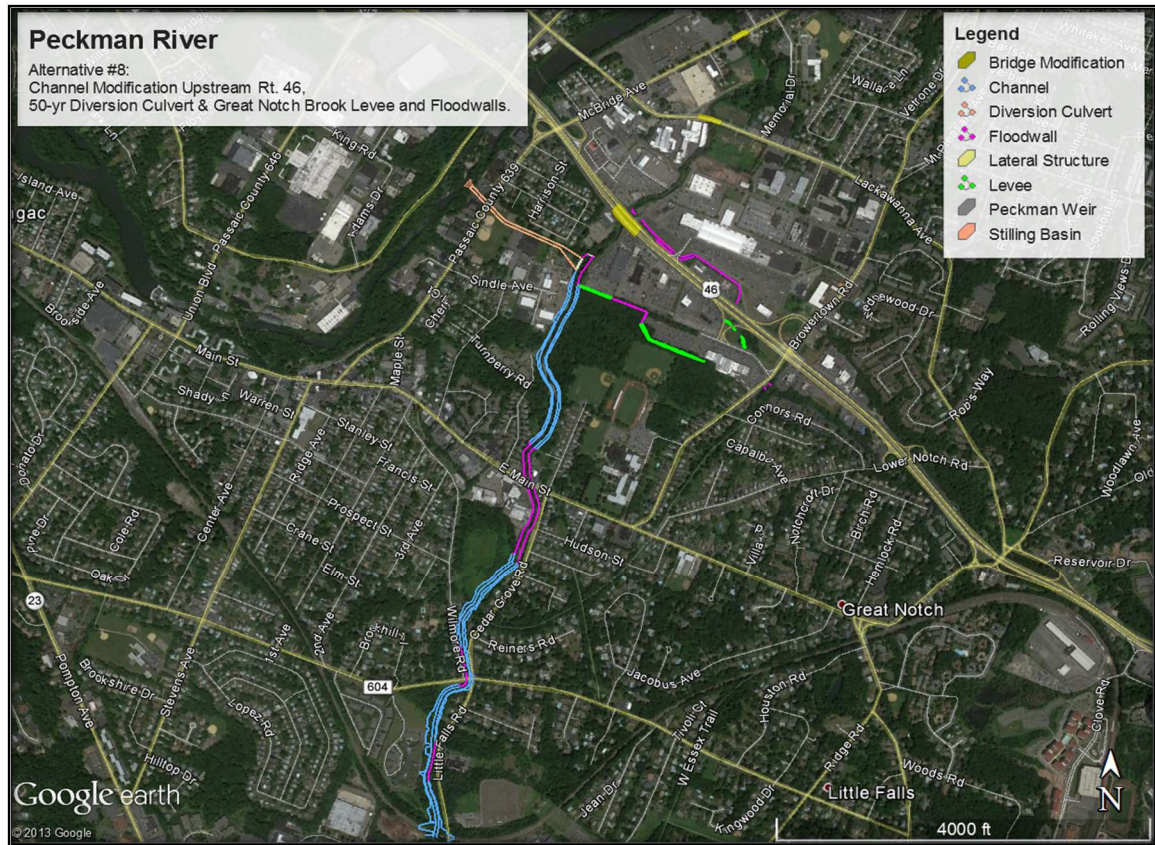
Alternative #8 – Combined Channel Improvement Upstream of Rt. 46 with Diversion Culvert & Great Notch Brook Floodwalls
